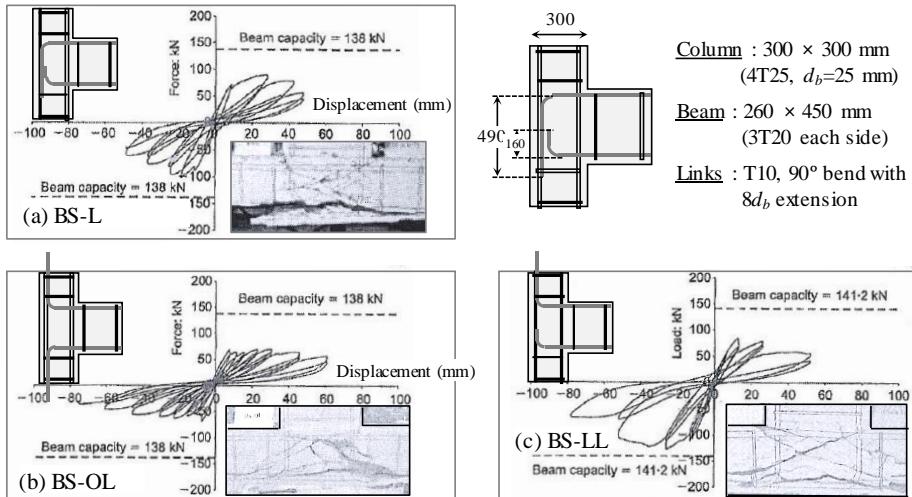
The effect of beam bar anchorage details in the study of Wong and Kuang (2006)
